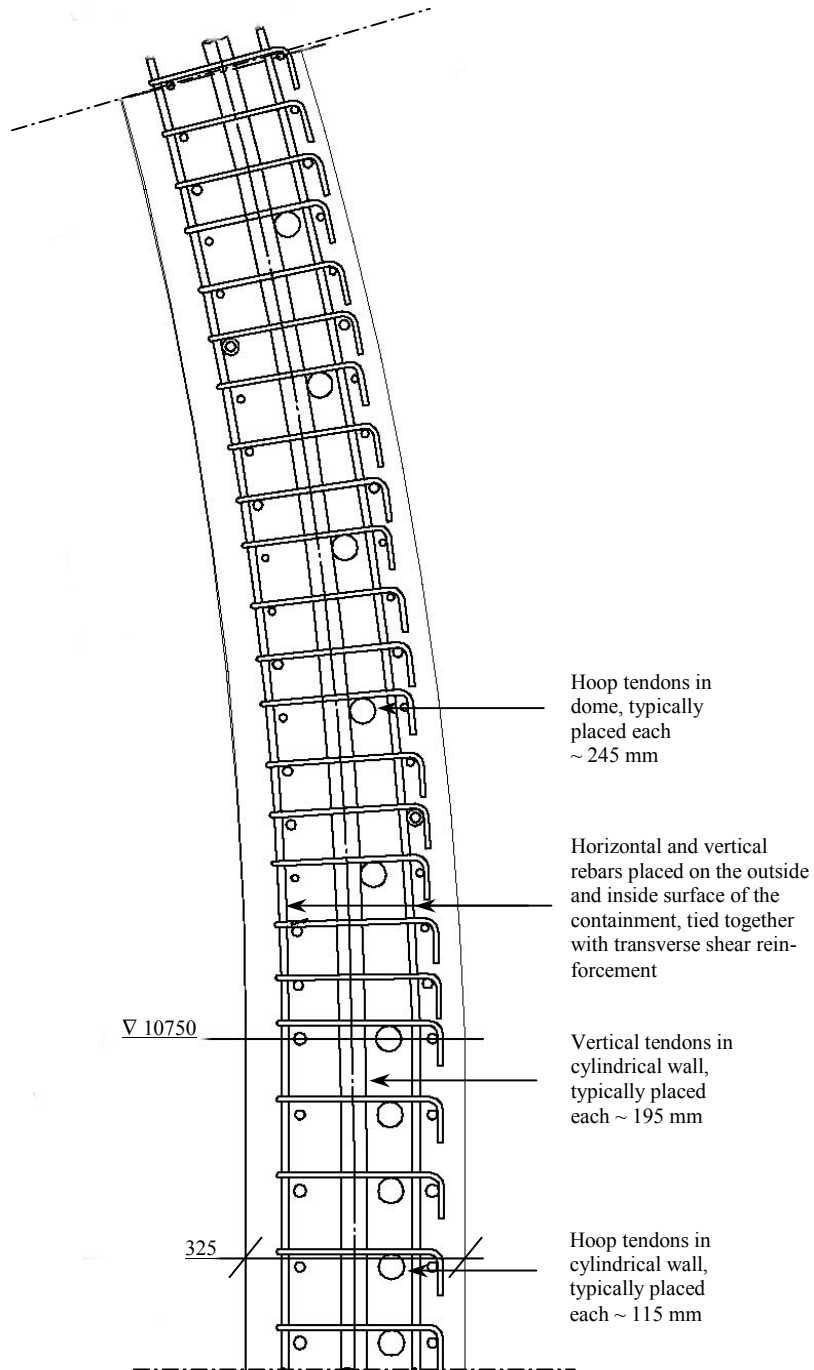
Pre-stressing tendons and rebar arrangement, section through wall/dome.
